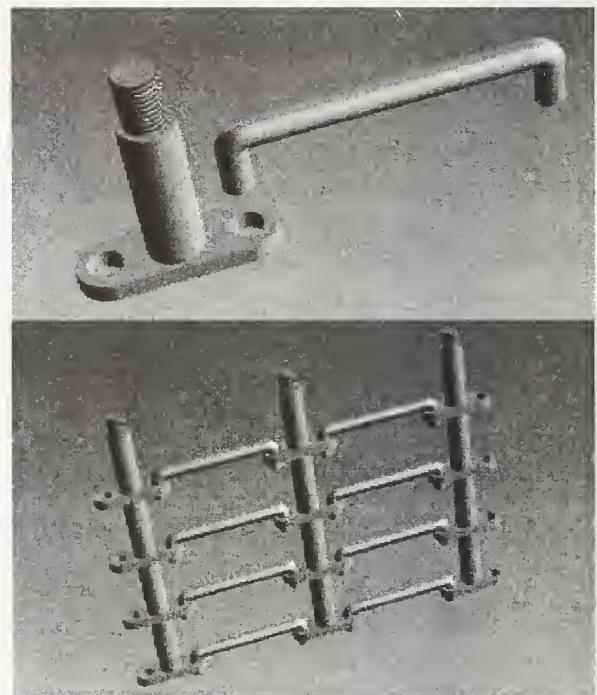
Steel reinforcement modules and progressively constructed reinforcement mesh
